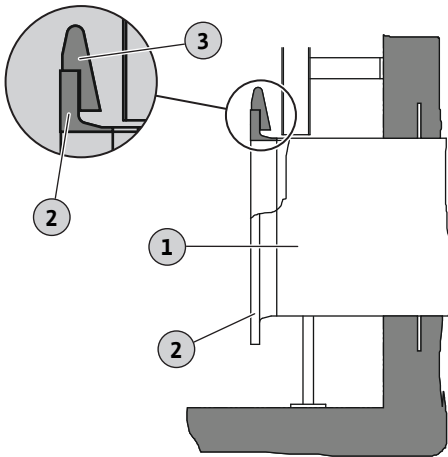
Pressure wedge: Discharge pipe with weld neck flange
